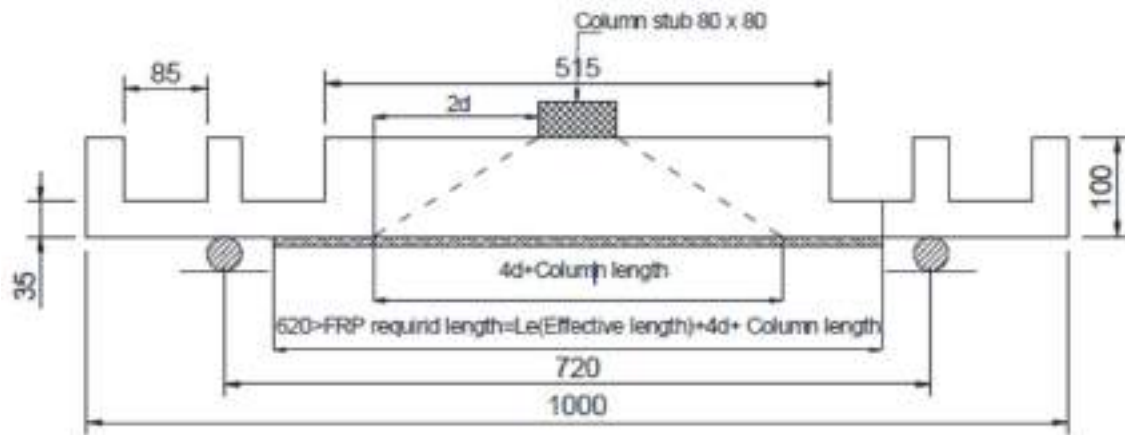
7 Loading and support system of waffle slab specimen IWS2.
